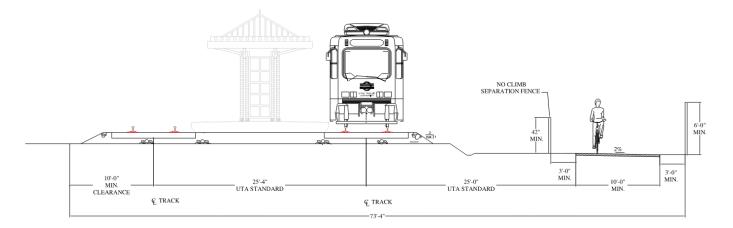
Rail Corridor Typical Section for Light Rail Trail Planning
